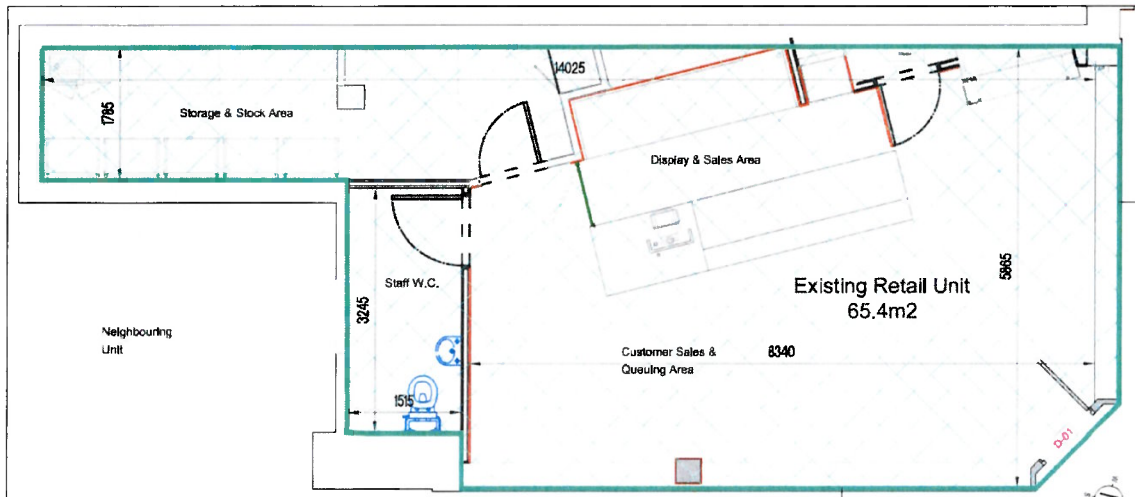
Ground floor plan of the Krispy Kreme retail unit.
